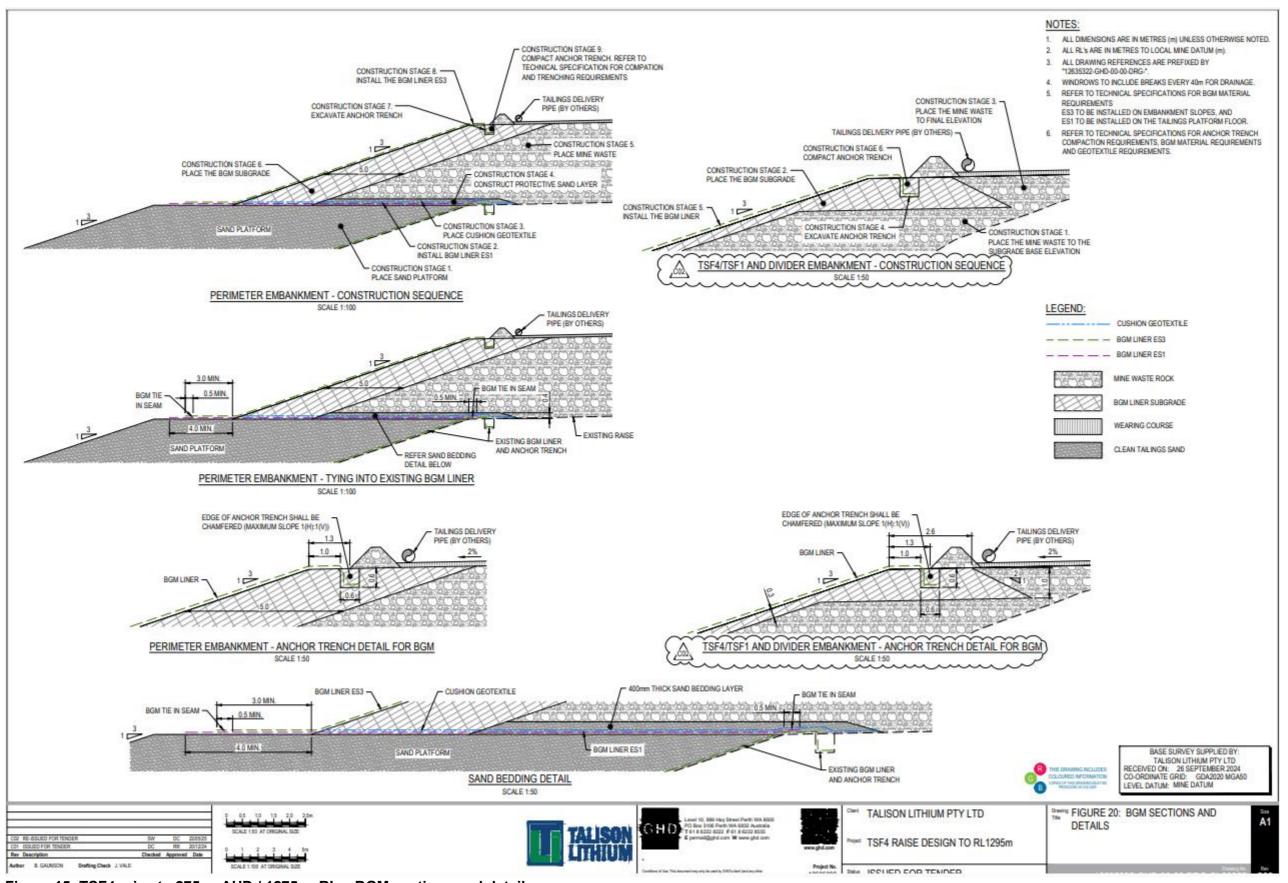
TSF4 raise to 275 m AHD / 1275 m RL – BGM sections and details
